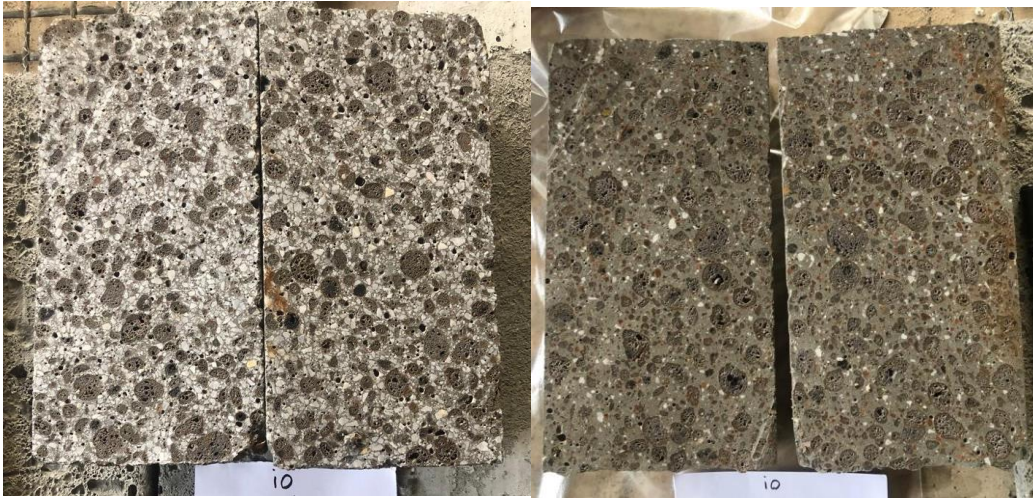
Longitudinal Cross-section of Mix #1 and #10
